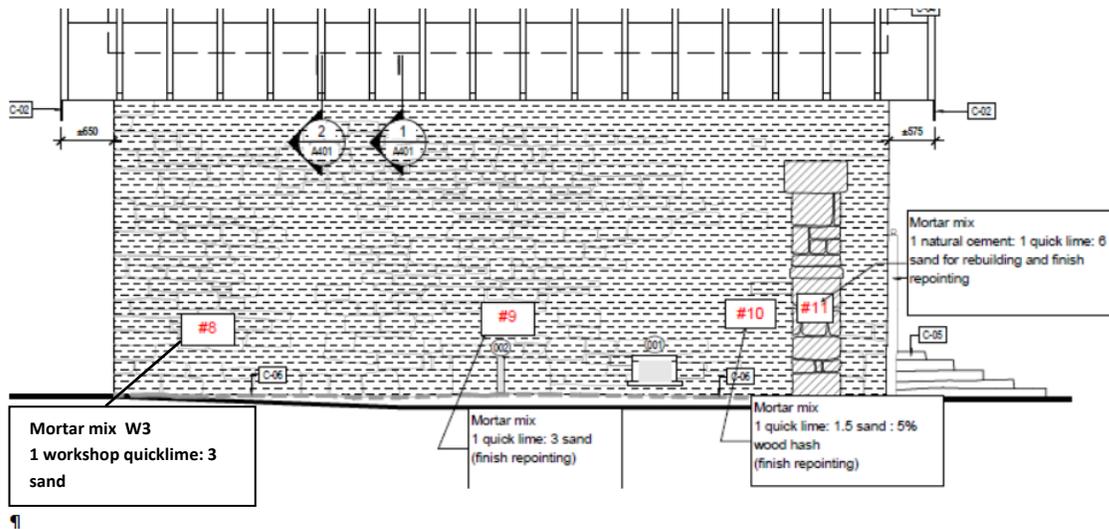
Site plane of south wall exposure where trial mortars were installed.
